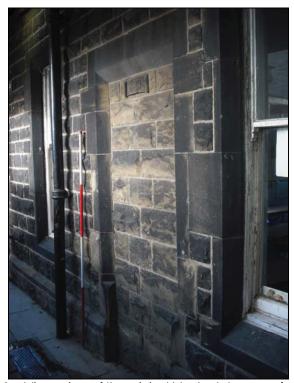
, 306: building 1, oblique view of the original blocked doorway, from the south southeast
